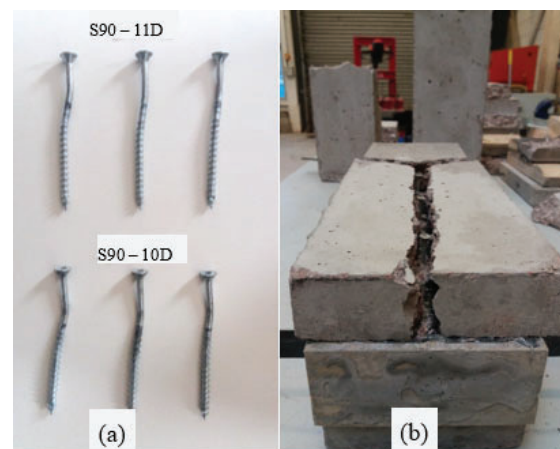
(a) S90 screw deformation (b) concrete failure S90 specimens
